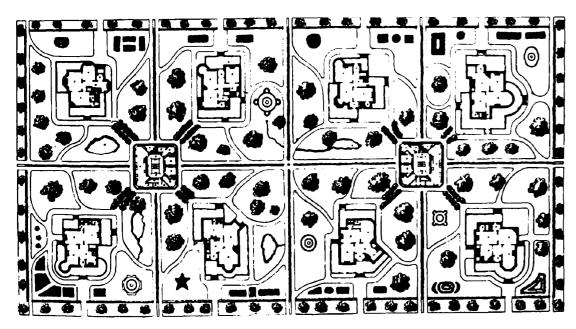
First plan of actual kitcheless houses in a suburban neighbourhood
